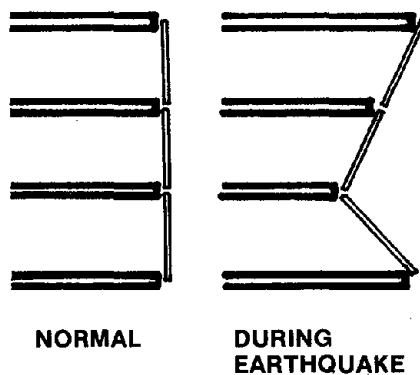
Effect of Cantilevered Exterior Walls vs. Simple Span
